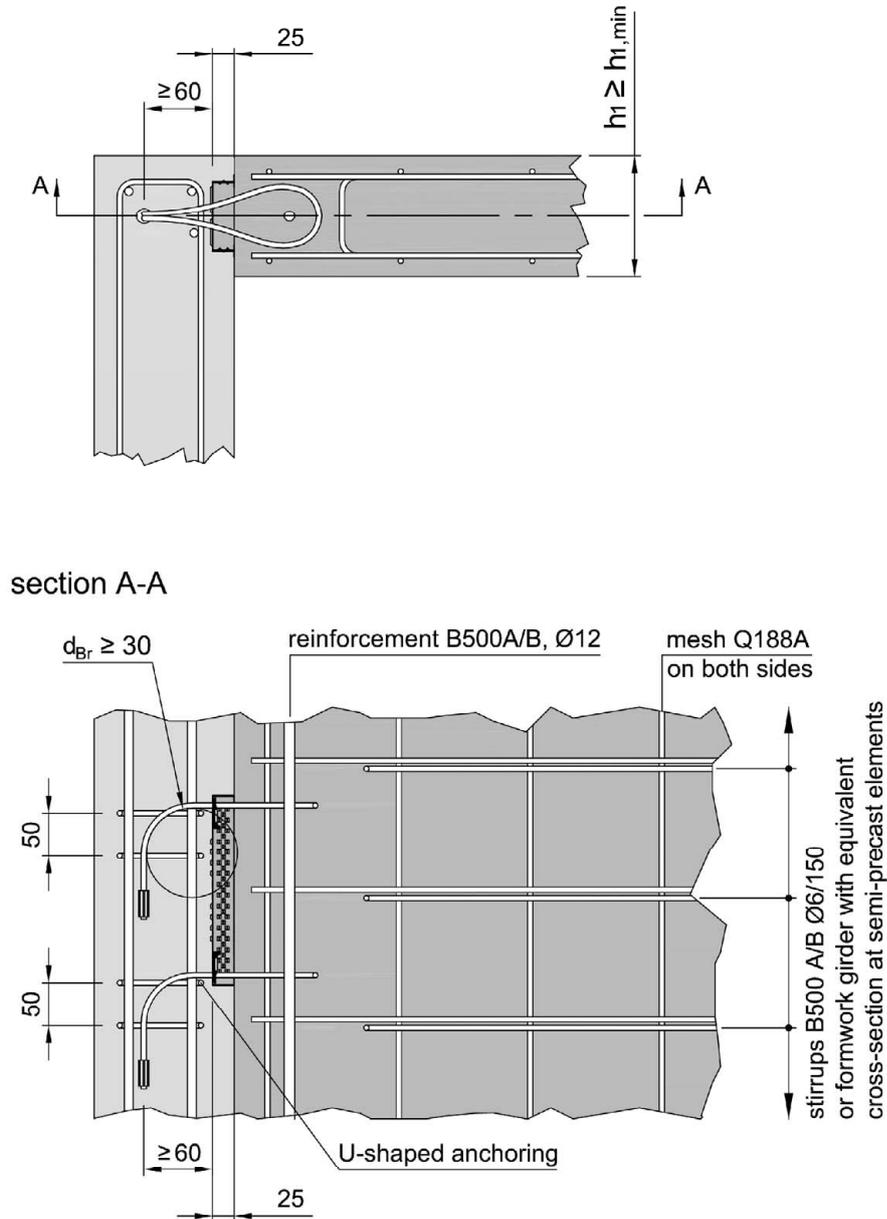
Corner connection with angled wire loops, dimensions, reinforcement
